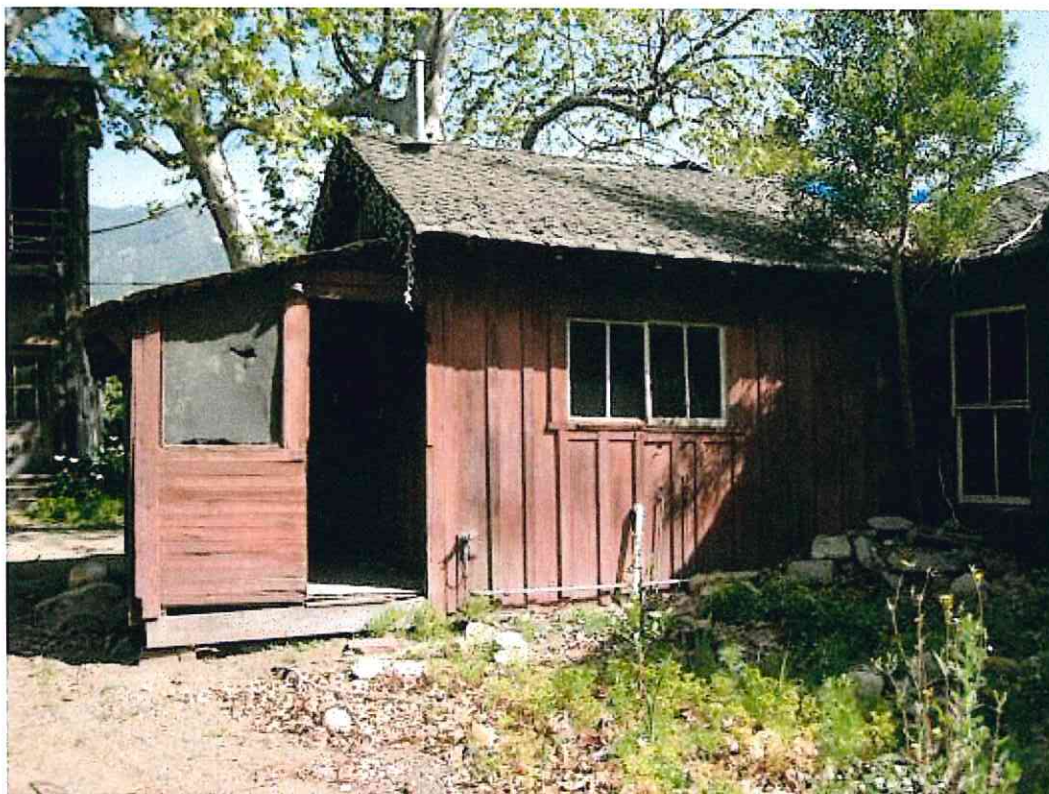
South side of kitchen wing. Lean-to at left to be replaced with a gabled extension and paired 2/2 pane windows to be added. Facing north. April 2010. A. C. Cole
